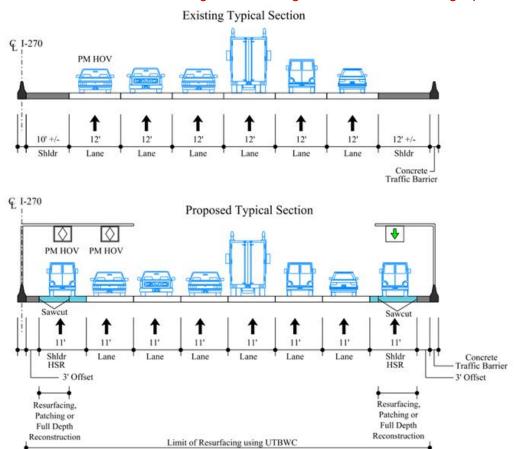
Existing and Proposed Typical Sections NB IS-270 South of Montrose Road
